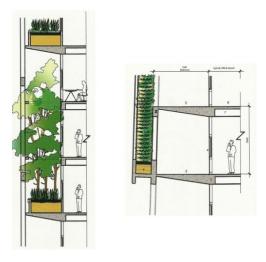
58 Façade arrangements for environmental contact in non-residential high-rise building, Chongqing Tower
